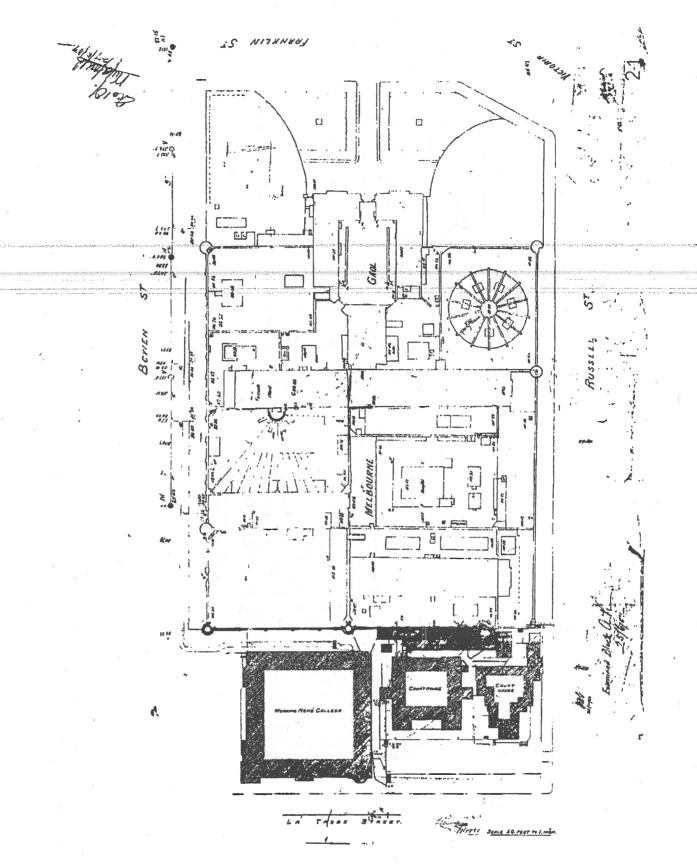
Composite Plan: 1902 Plan of Old Melbourne Gaol & 1908 Plan of Old City Court (former Supreme Court)
